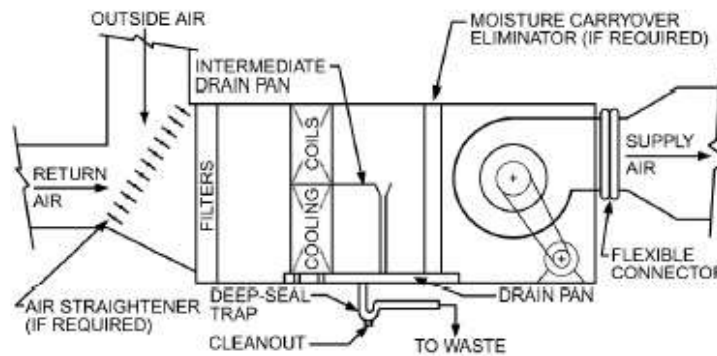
Typical Arrangement of Cooling Coil Assembly in Built-Up or Packaged Central Station Air Handler
